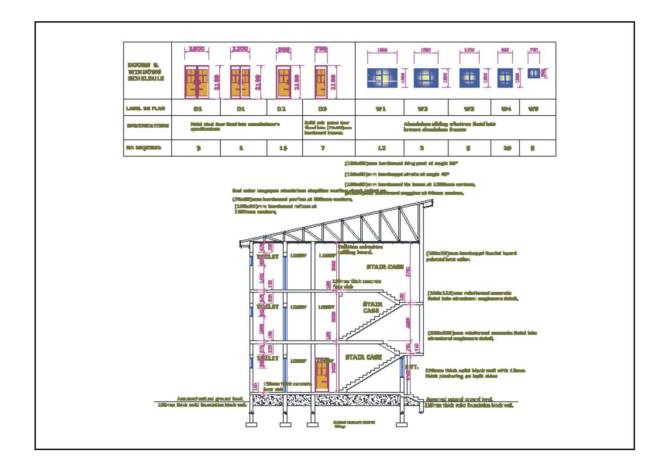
Prototype Botanical Garden Structure Building Section and Schedule Plans.
